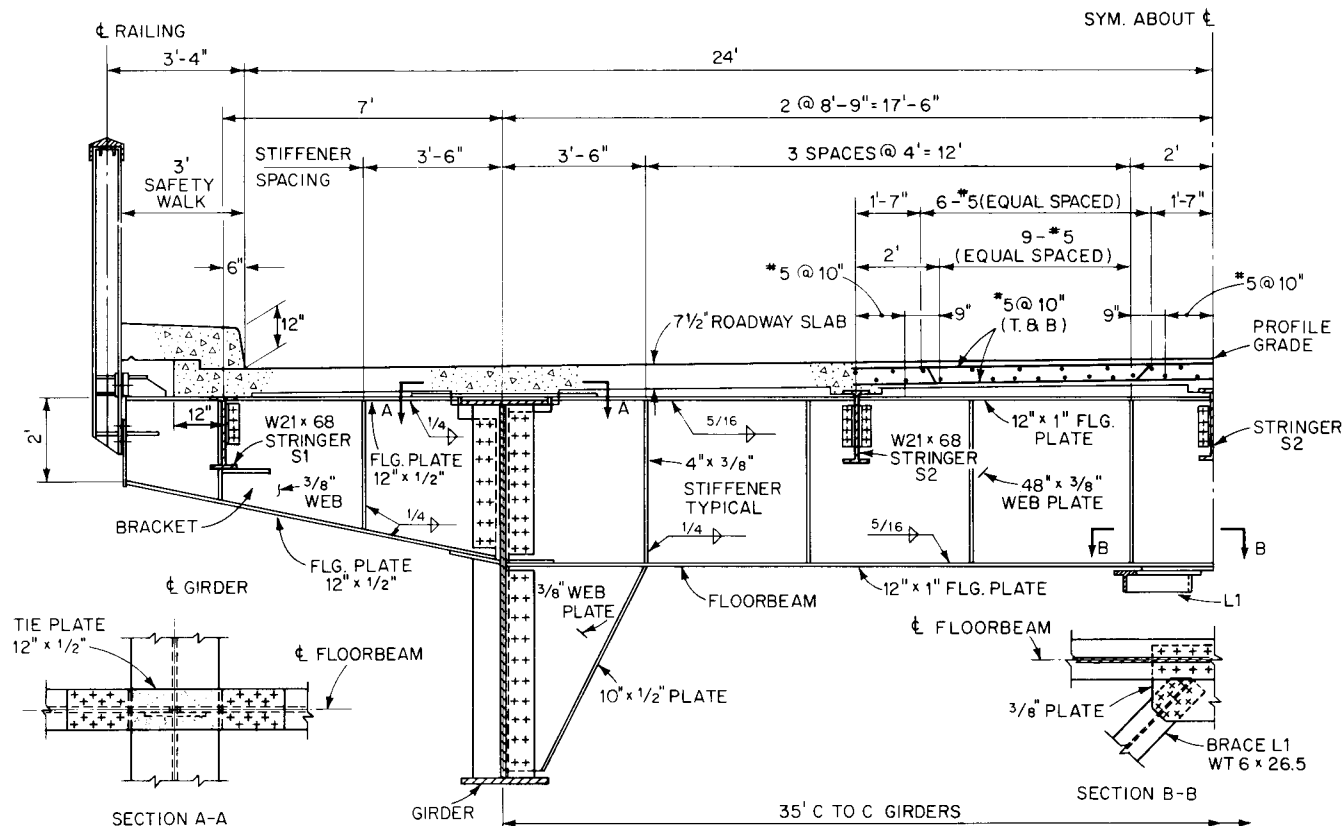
Typical cross section of deck-girder bridge at a floorbeam.
